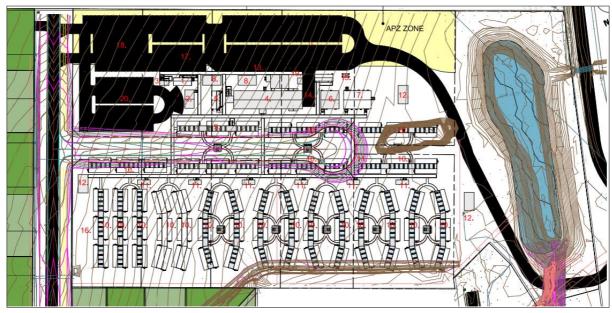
Site Plan Building Areas. Source: Andre Melville Building Design 2024
